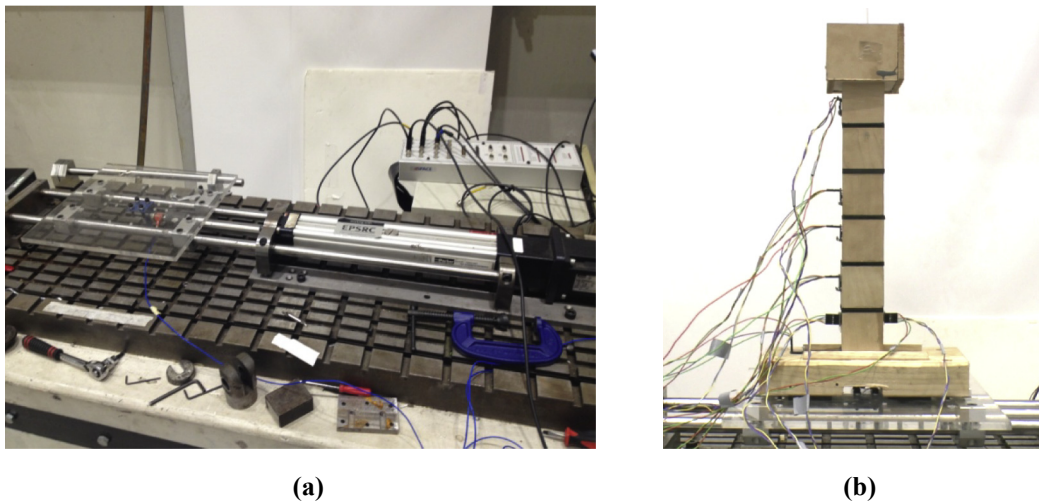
Experimental test setup: (a) Uniaxial shaking table (b) rocking column specimen mounted on to the shaking table.
